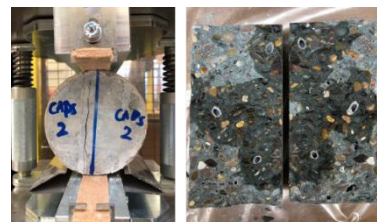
Splitting the cylindrical specimens to count the amount of broken capsules in a certain crack plane (note: the darkest concrete surface is the area covered by WRA)
